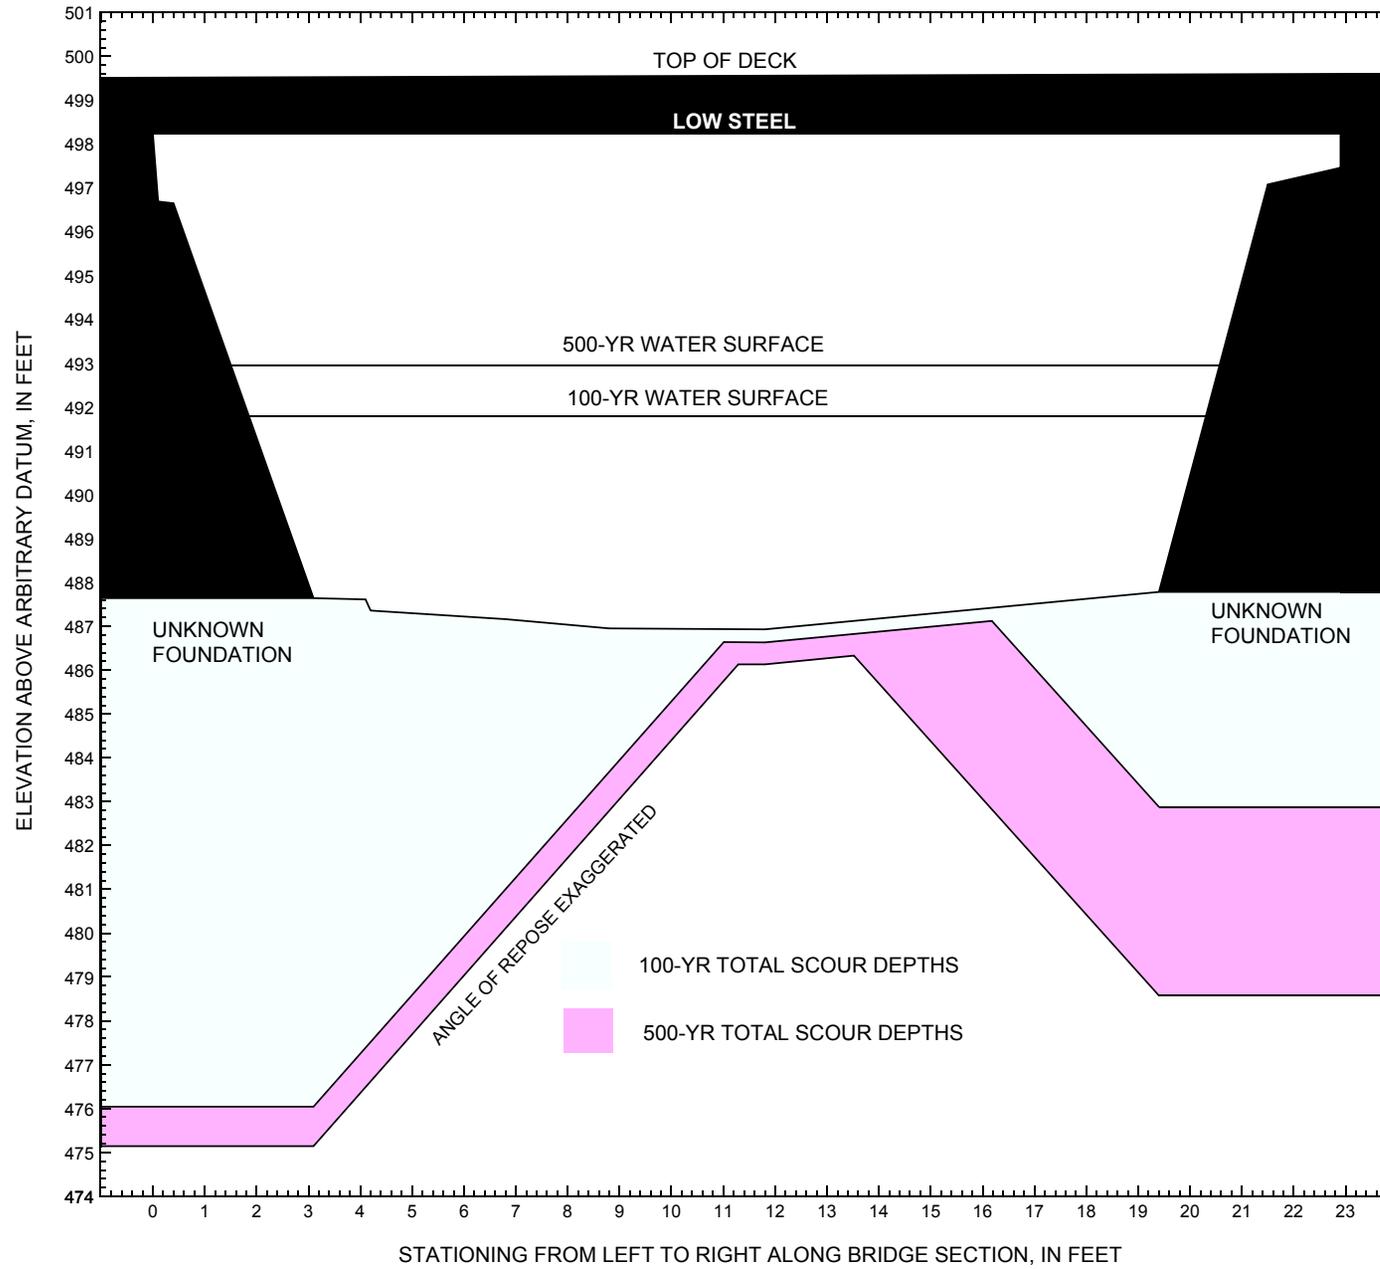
Scour elevations for the 100- and 500-yr discharges at structure MTHOTH00100061 on Town Highway 10, crossing Perry Brook, Mount Holly, Vermont.
